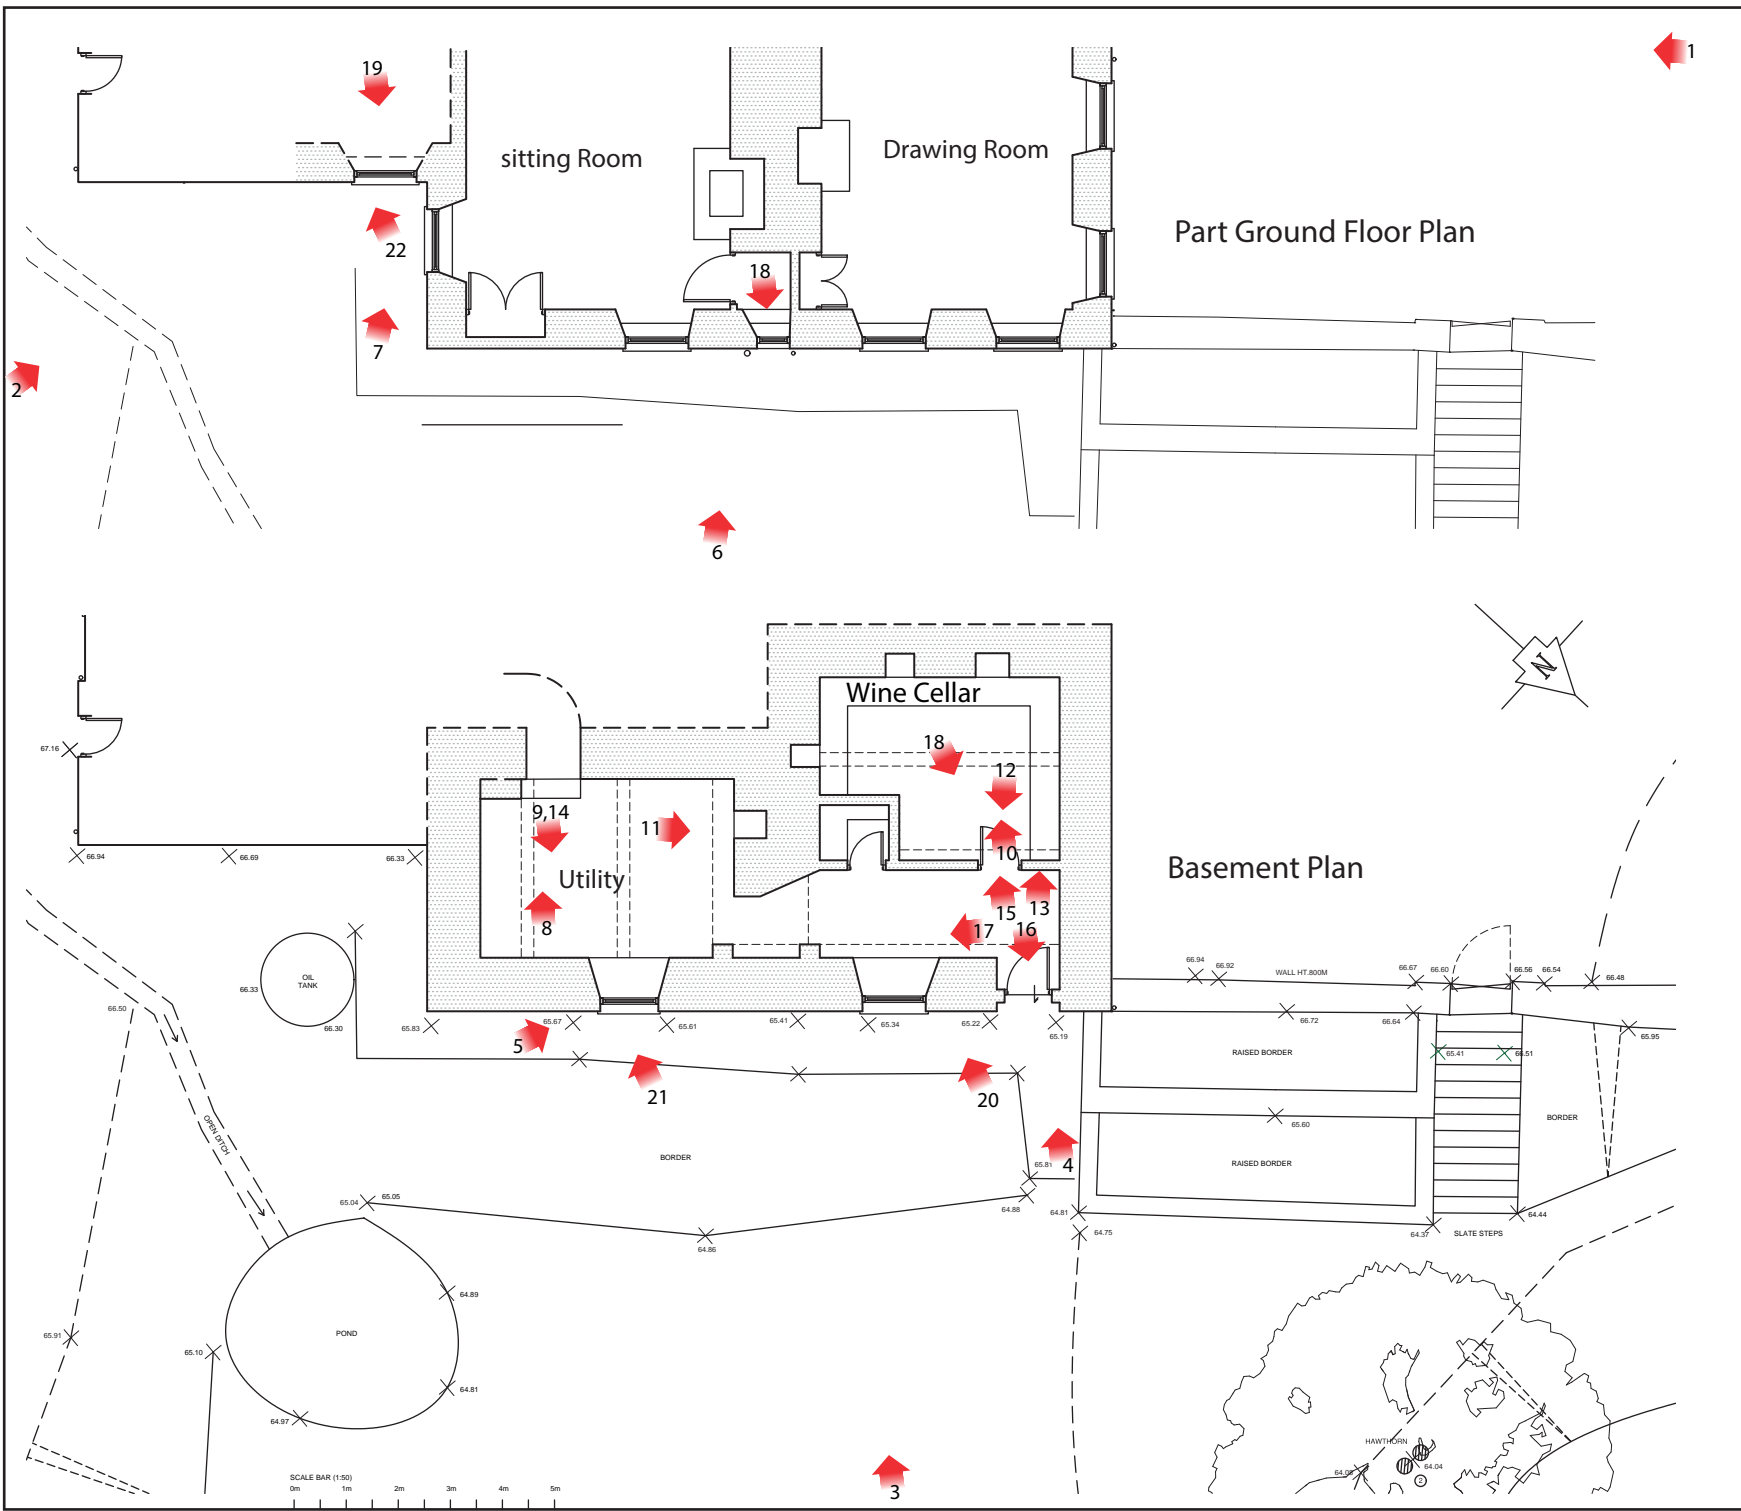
Photo Location Plan (Building Recording). Floor Plans courtesy of Harries Planning Design Management.
